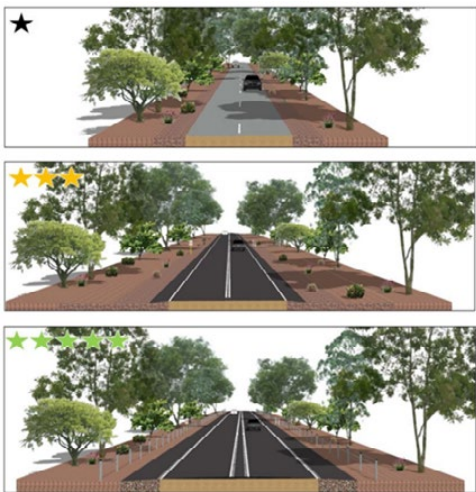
Example of Star Ratings for typical rural roads found within Singleton Council
